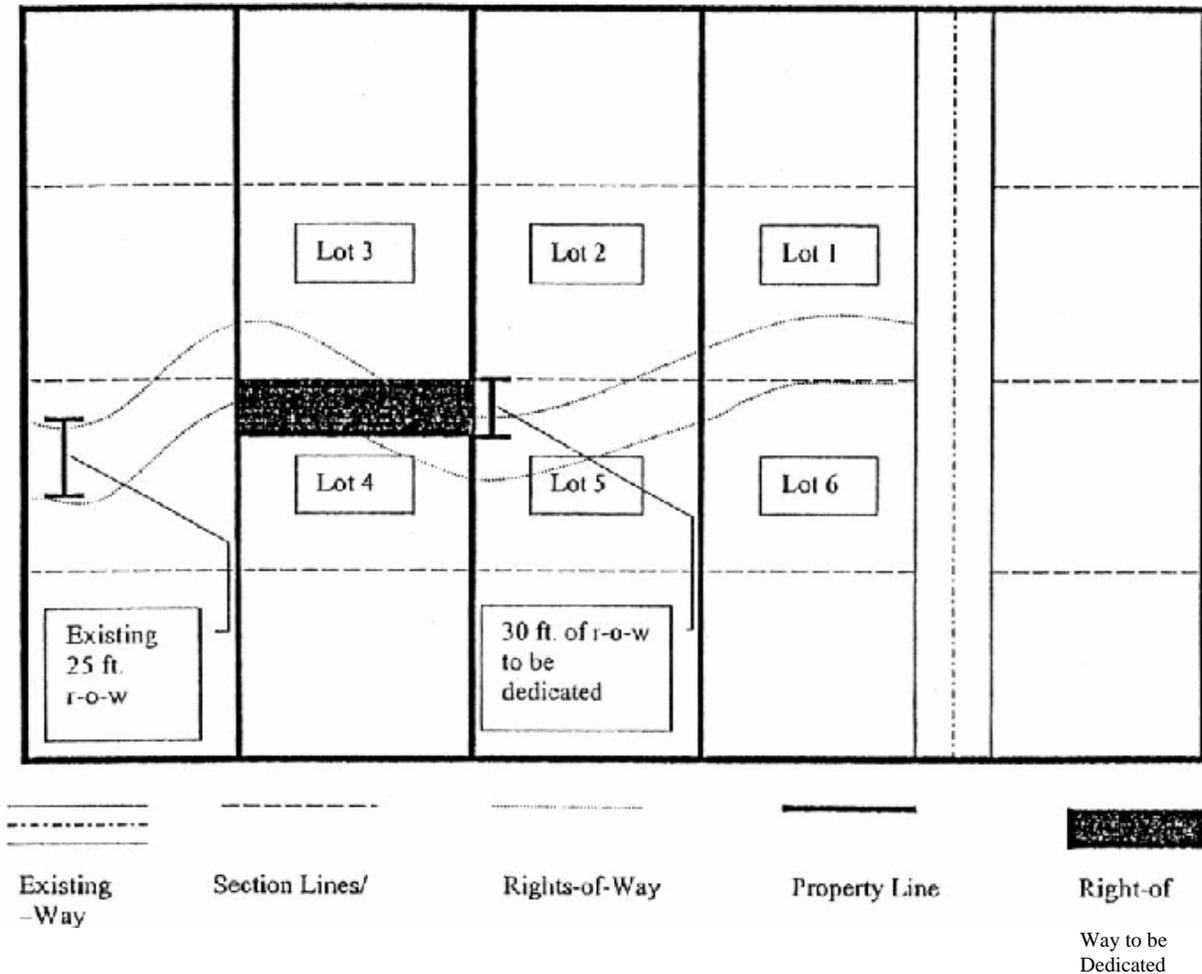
(Illustration No. 4 depicts the property that must be dedicated to the town if the owner of Lot No. 4 desires a building permit. Illustration No. 4 assumes that the owner of Lot No. 4 has requested a building permit for a structure on Lot No. 4 and he wants to use the interim roadway built by the owner of Lot No. 1 for ingress and egress to the property. It also assumes that the entire twenty-five (25) foot right-of-way was originally dedicated to the town by the owner of Lot No. 1 or his predecessor in interest. The illustration evidences the thirty (30) feet or right-of-way that the owner of Lot No. 4 would have to dedicate to the town in order for the town to acquire the sixty (60) feet required by Comprehensive Plan and Land Development Code.)
